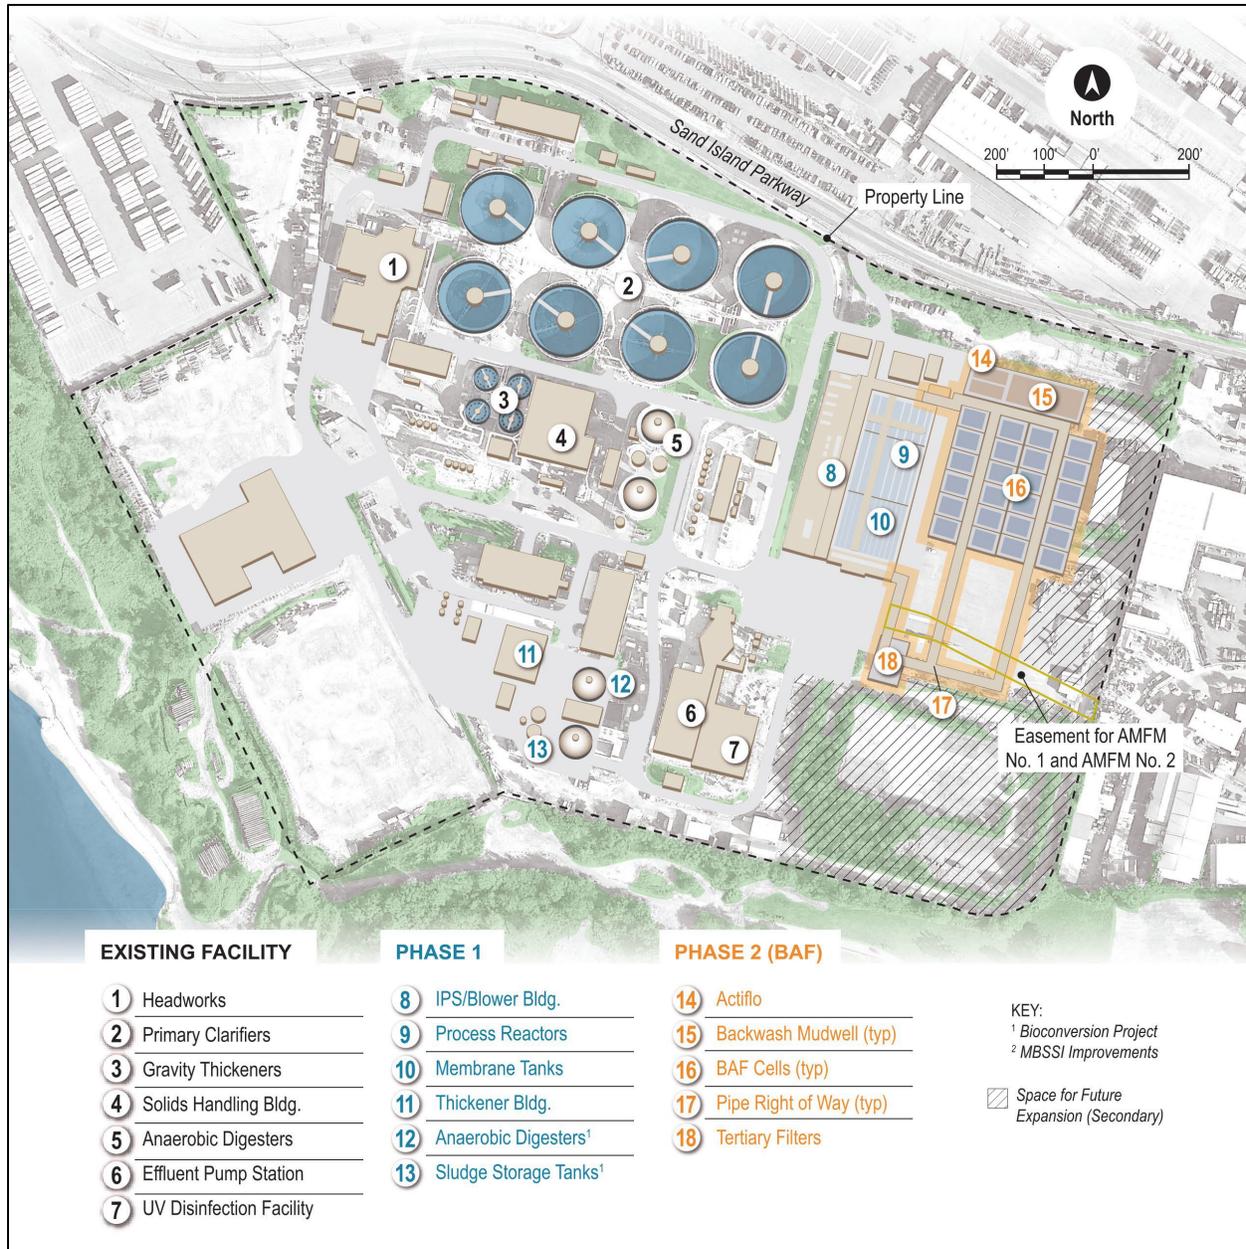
Conceptual Site Layout for the BAF Alternative
